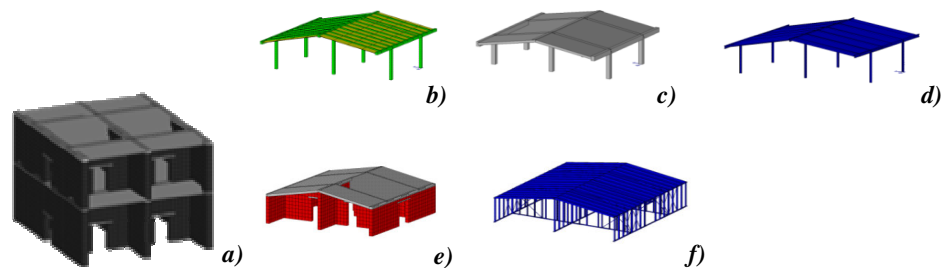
The study masonry structural unit (a) and construction systems for vertical addition (from b to f).
